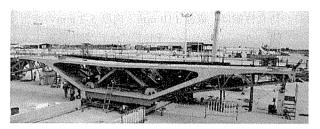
Typical D6 segment 図-5 D6標準セグメント
